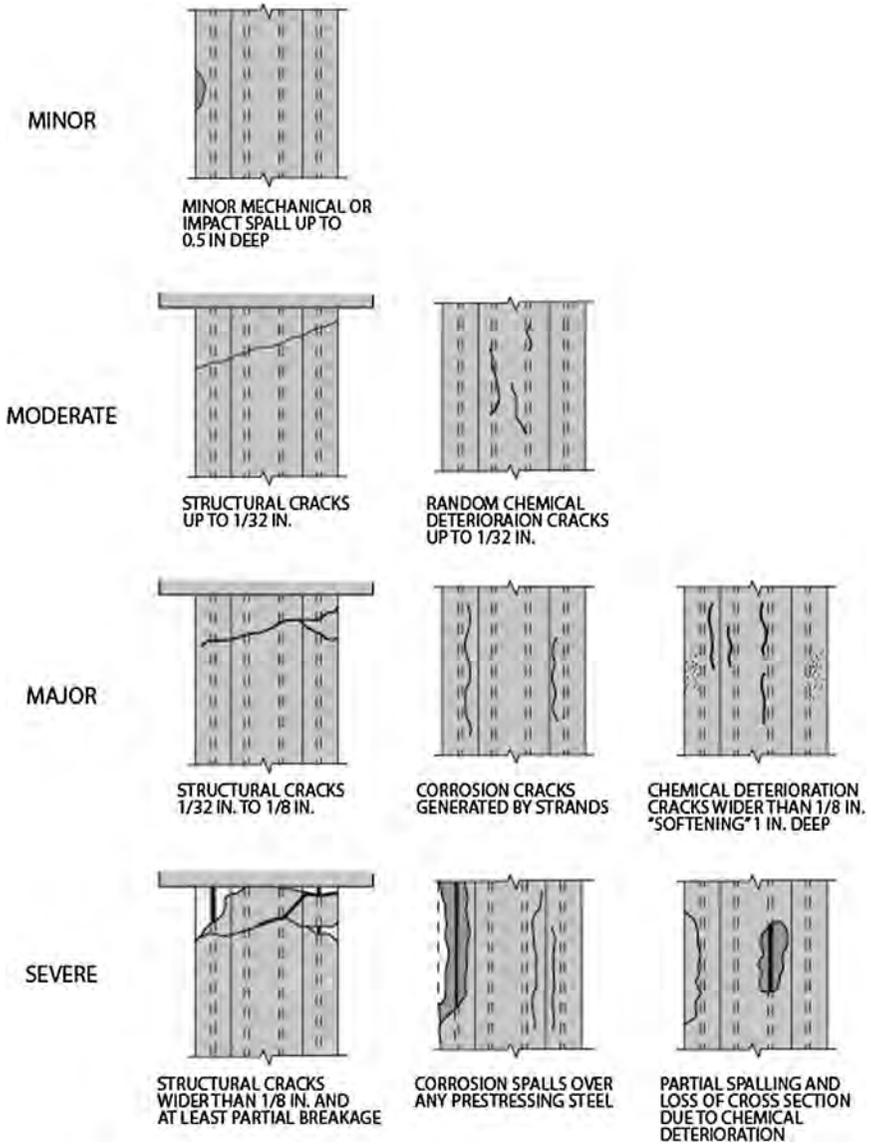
Damage ratings for prestressed concrete elements
